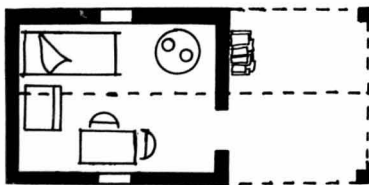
Rocky Mountain Cabin, Winter Floorplan
